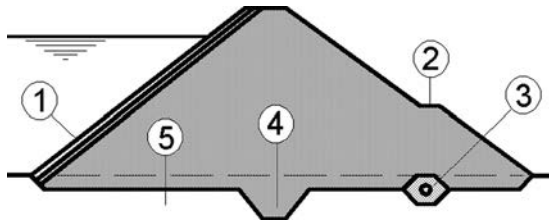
Cross-section of an earthfill dam. (1) Slope protection; (2) berm; (3) drainage; (4) cutoff trench; (5) non-rock foundation.
